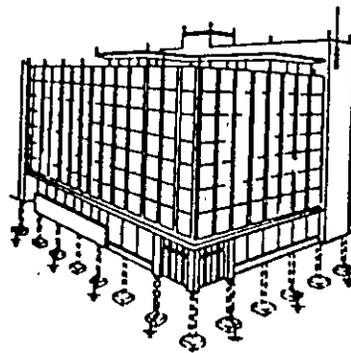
Steel building: Steel framing in tall buildings should be connected to air terminals. This type of structure requires special lightning protection.
